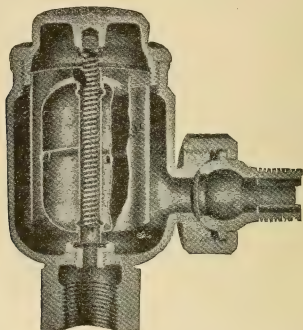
WEBSTER RADIATOR TRAP. FLOAT TYPE.
